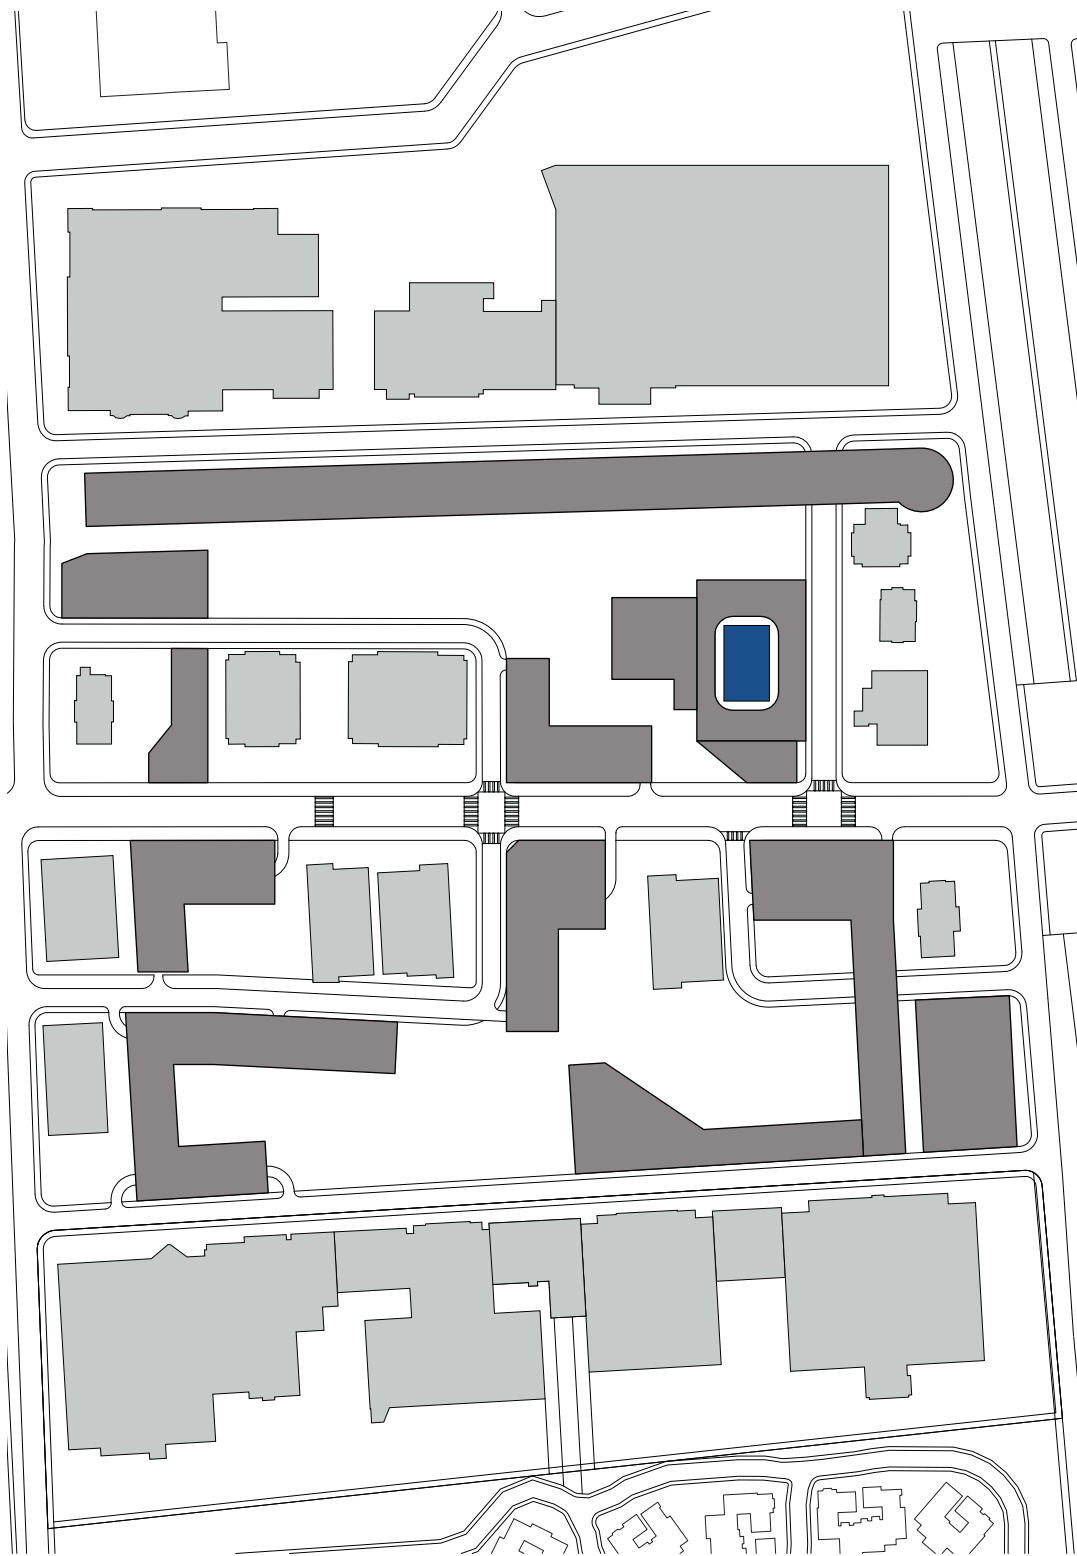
site plan—new buildings: roof level (1:2,500)
